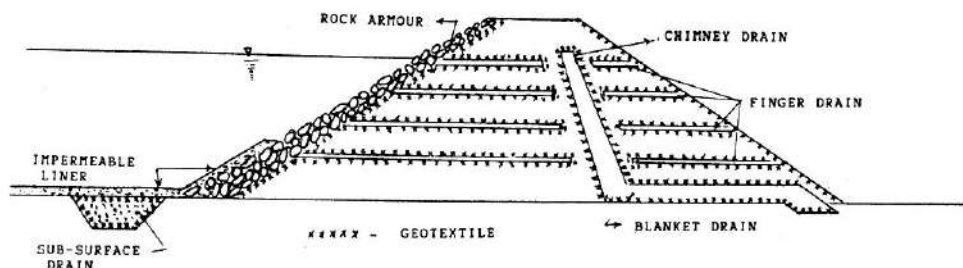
Schematic diagram of different applications of geotextiles in dam construction
